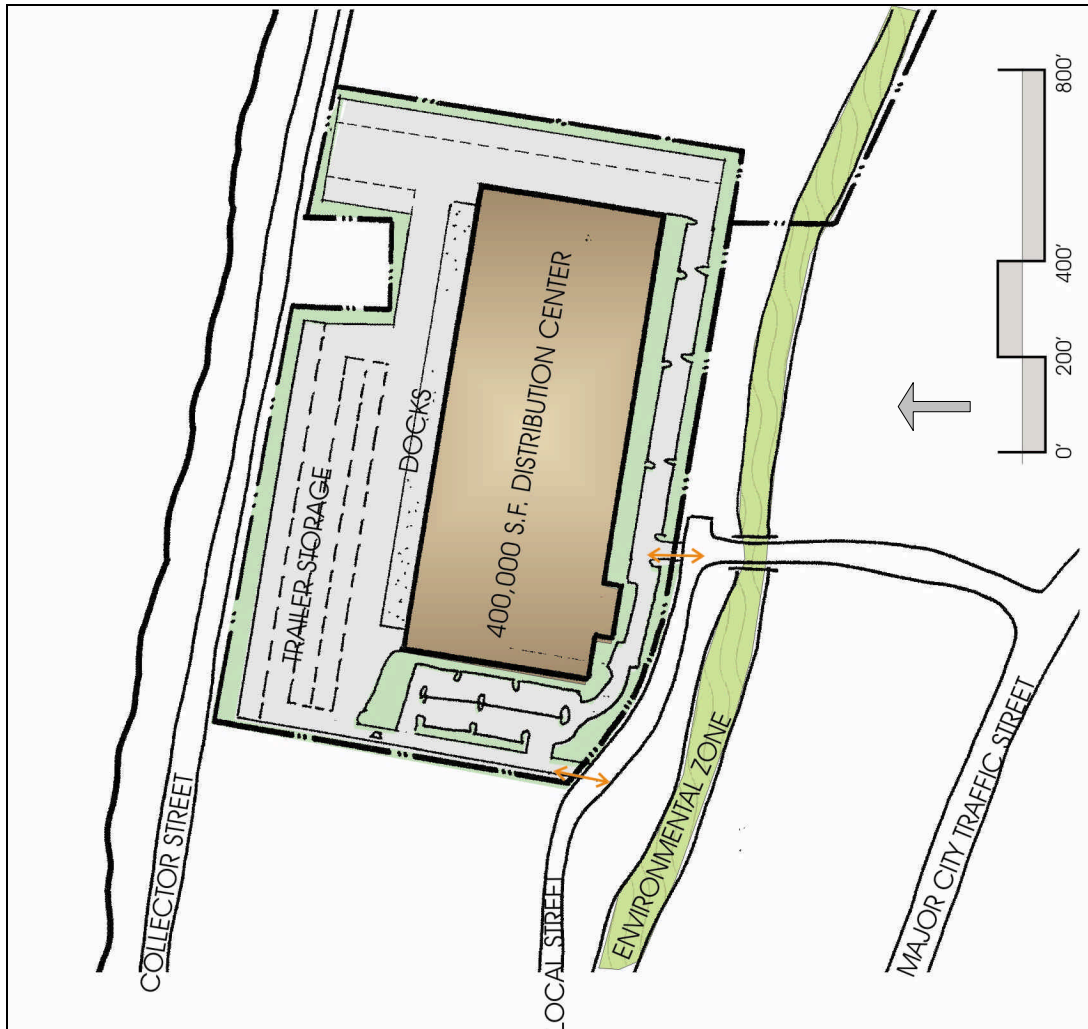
Warehouse Distribution Greenfield Conceptual Site Plan
